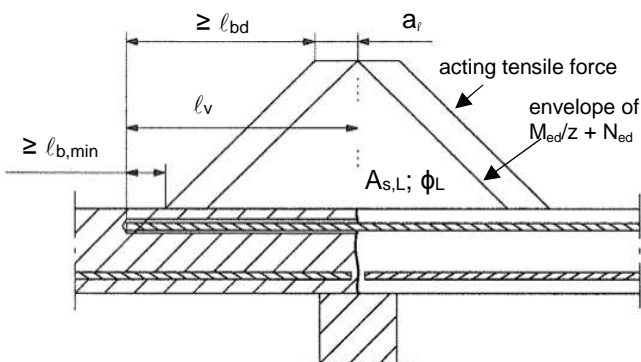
Overlapping joint at a foundation of a wall or column where the rebars are stressed in tension
